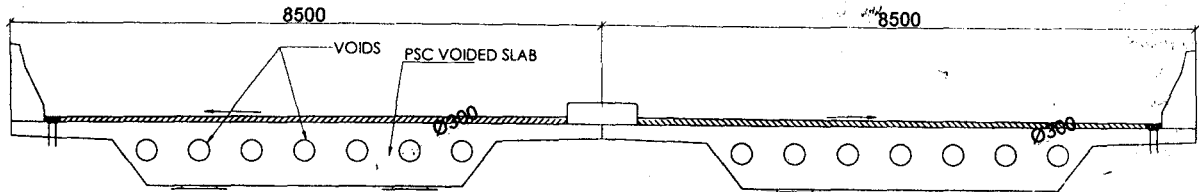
Typical cross section with PSC Voided slab for 4-lane deck
